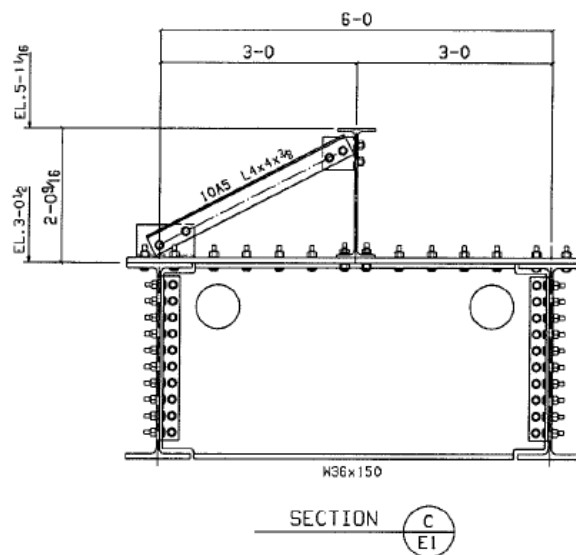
Section of Diaphragm Plate at Bottom of Test Assemblage
